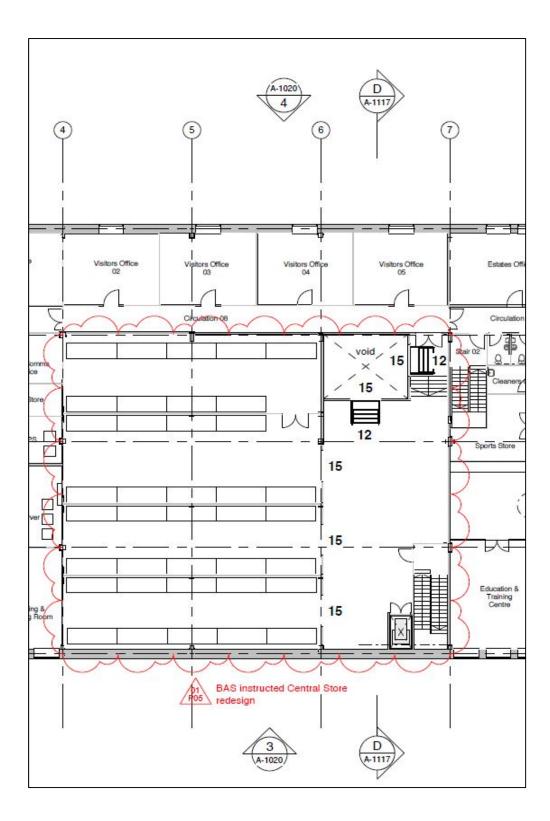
Central store ground and first floor layout, after WS4a redesign.
